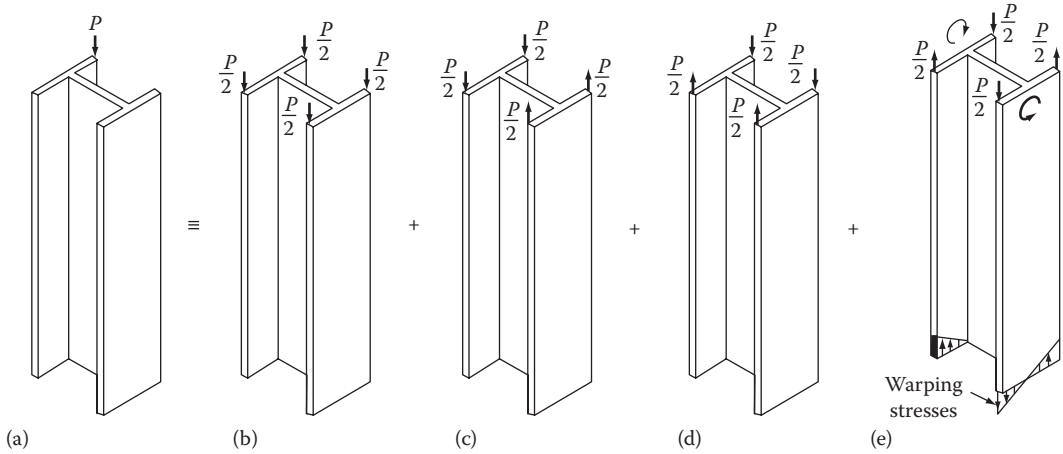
I-shaped cantilever beam: (a) vertical load at corner, (b) symmetrical axial loading, (c) bending about *x*-axis, (d) bending about *y*-axis, and (e) self-equilibrating loading producing bimoment.
